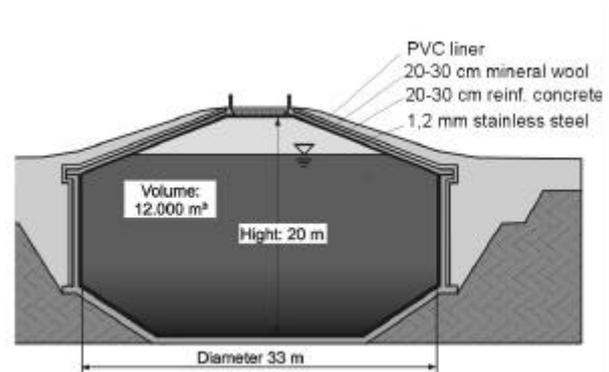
12 000 m³ hot water pit storage. Cross-section, main dimensions and components.
